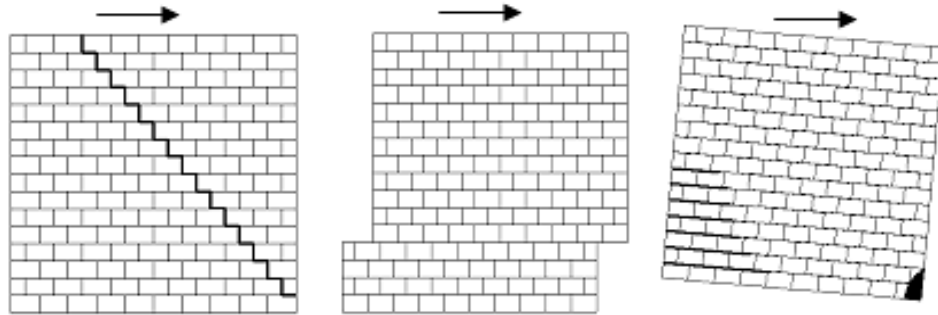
In-plane failure mechanisms of masonry walls.
